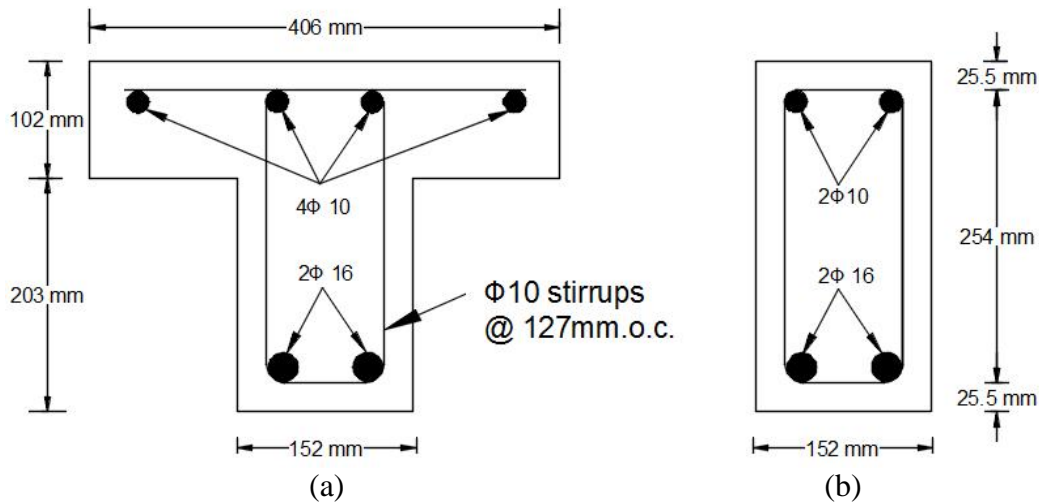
Beam cross section details (a) T beam; (b) rectangular beam
